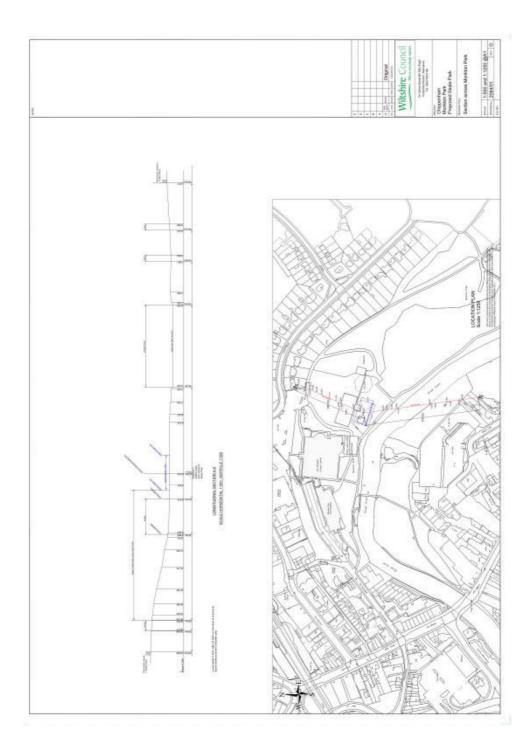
(A) -SITE PLAN INCLUDING TRANSECTION THROUGH THE SITE
